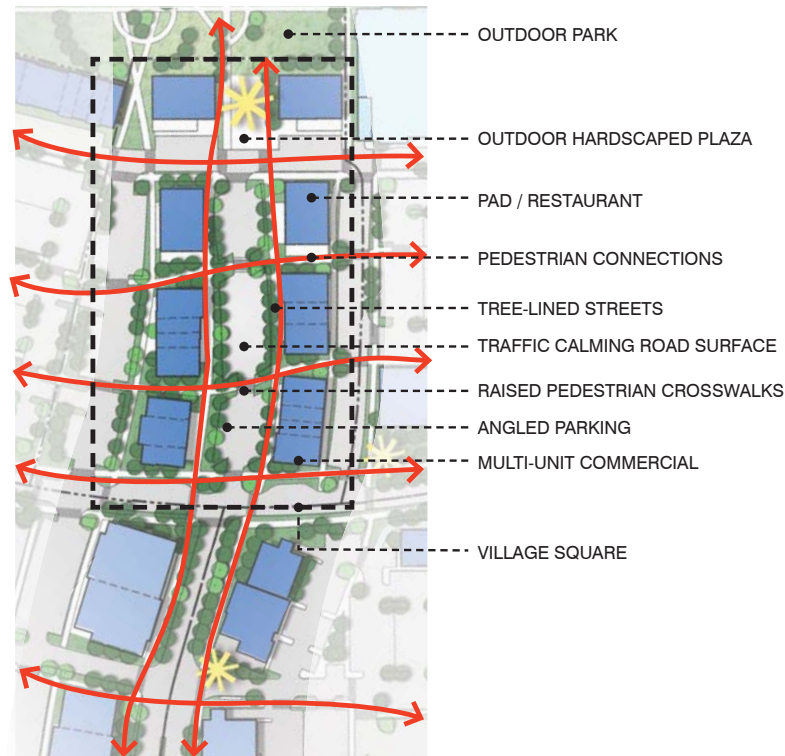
HIGH STREET CONCEPTUAL PLAN
